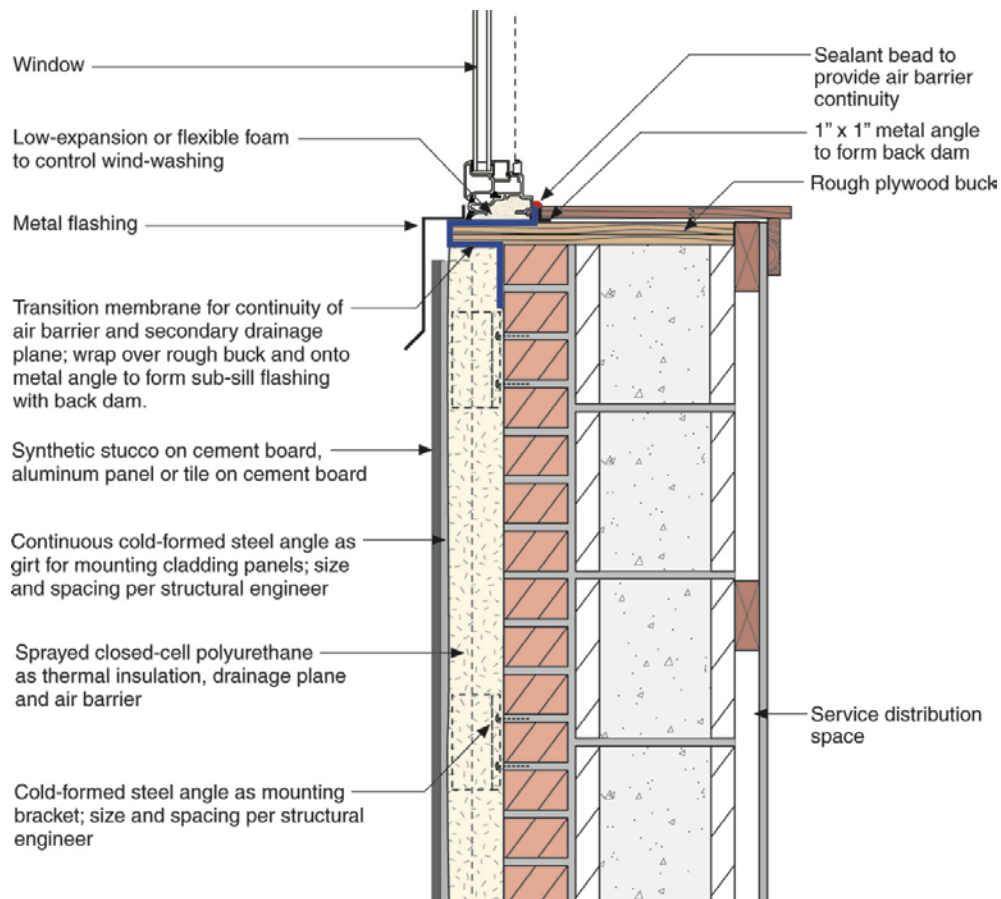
Window installation for an exterior insulation retrofit of a mass masonry wall.
